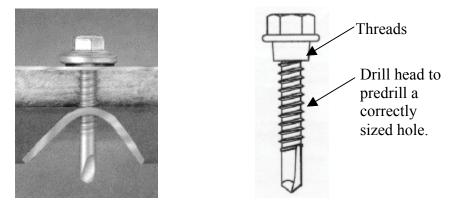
Typical Self-Drilling Sheet Metal Screws
